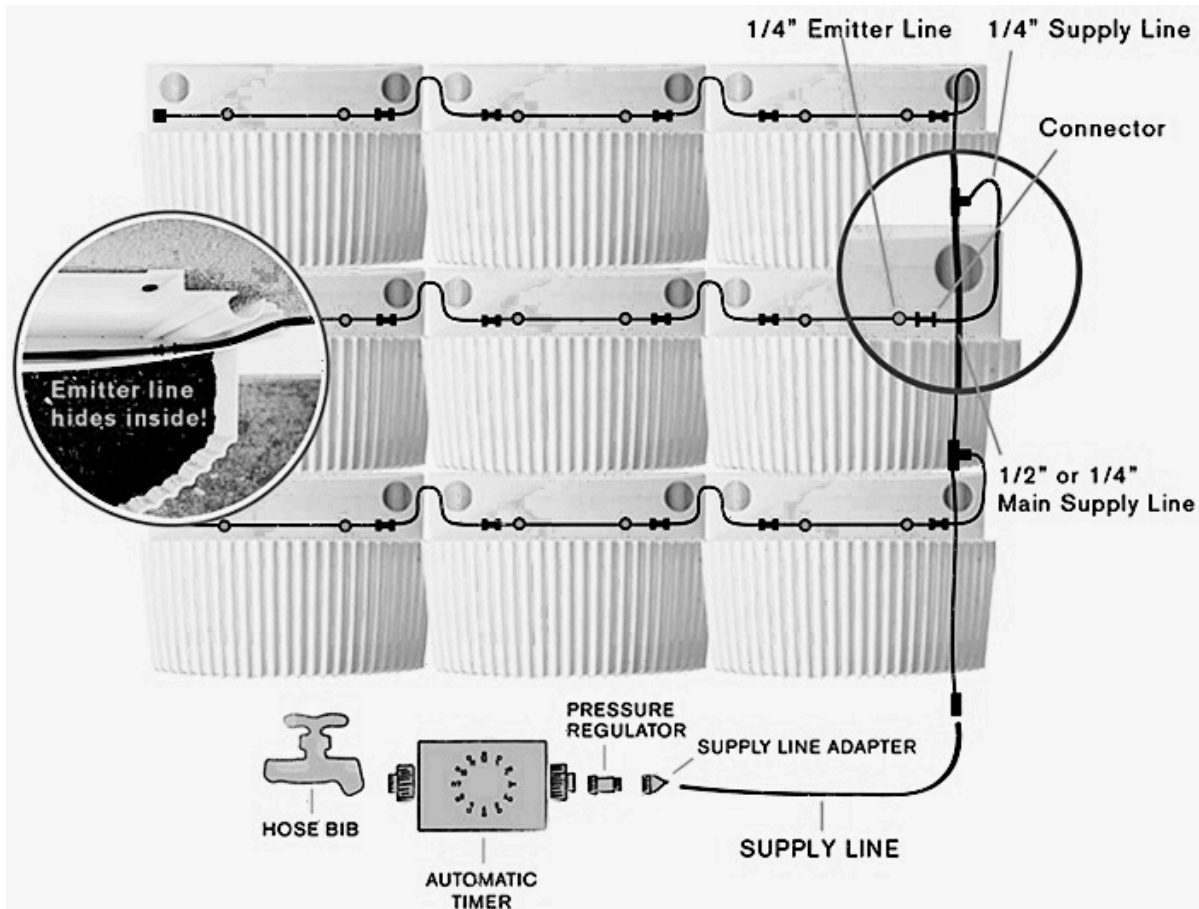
LiveWall® Sprout DIY living wall system is a three tiered living wall design that is 2 feet and 8 inches wide, approximately 4 feet tall, and 5 feet and 3/8 inches in depth. The figure illustrates a fully installed Sprout living wall system. This particular living wall system is a pre-fabricated living wall system.
